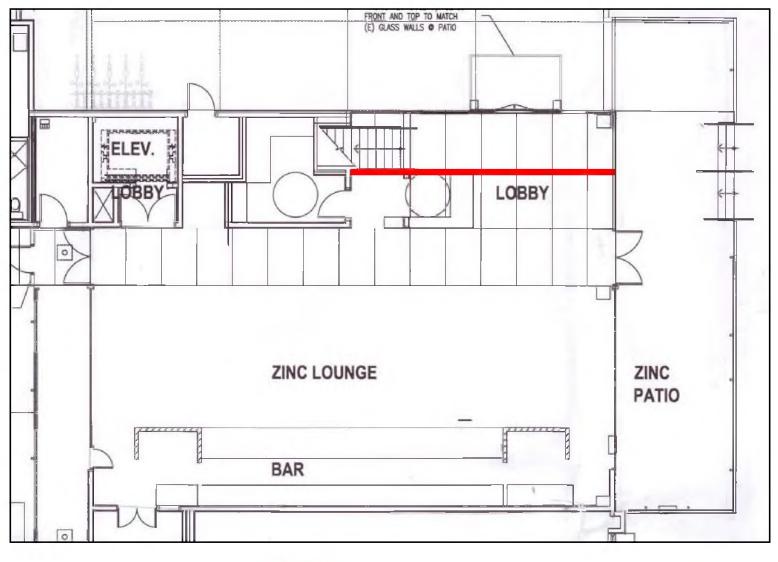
Mitigated Maximum Noise Level at 1st Floor Elevation - Front Entrance with Vestibule
